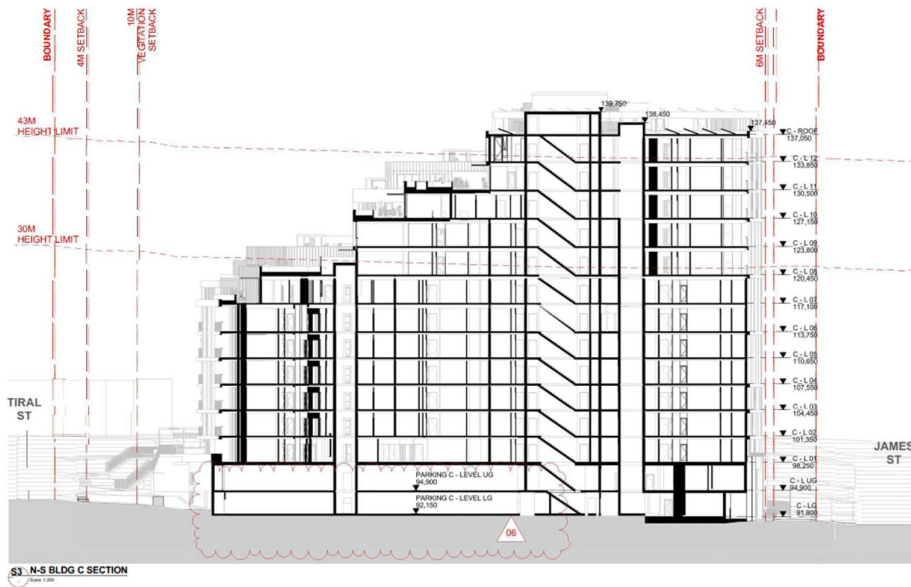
Approved and Proposed N-S Section of Building C (2 of 2)
